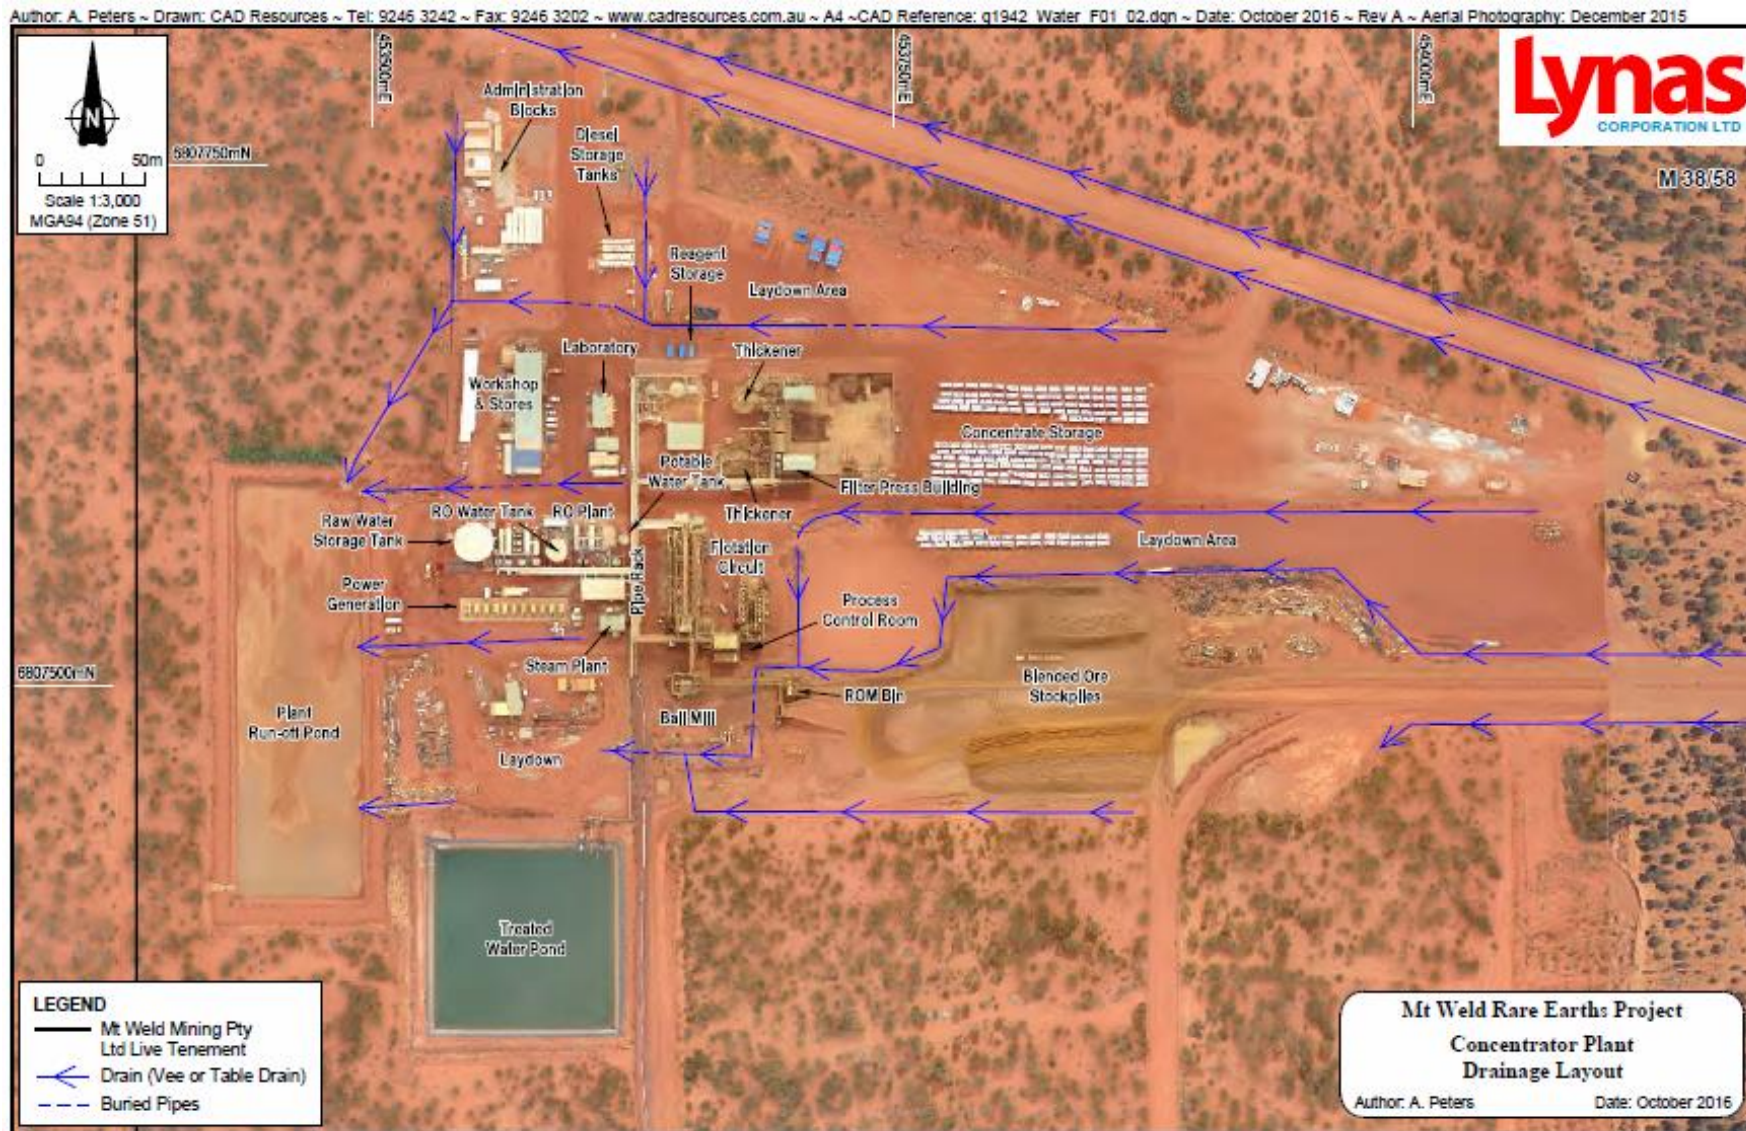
Concentrator (processing plant) containment infrastructure and stormwater drainage layout.
